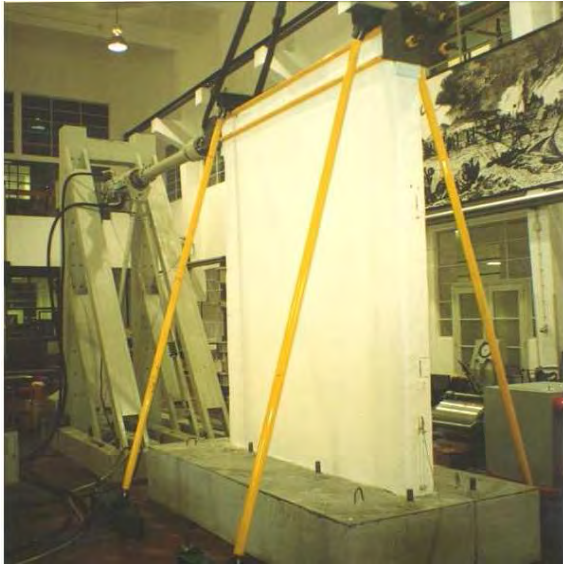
Specimen of masonry wall for a shear test in laboratory (21)
